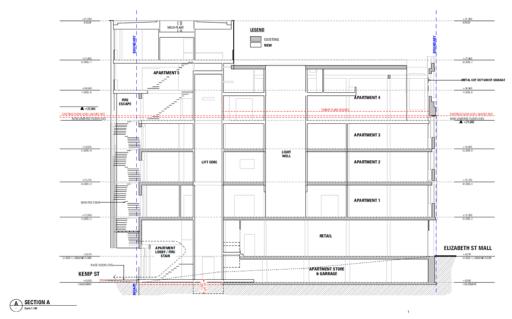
Section through the building (with proposal marked-up) – showing the existing form of the basement. From JAWS Architects Drawing 20035 DD05.
